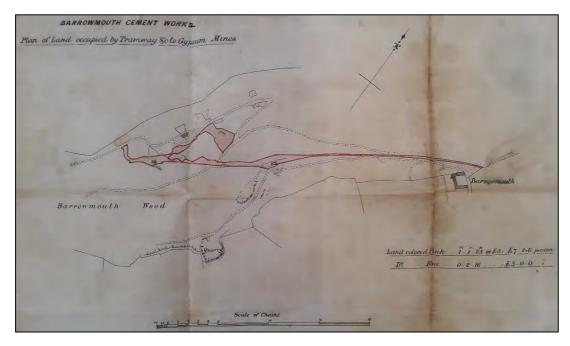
Plan of land occupied by tramway to gypsum works, 1888-1894 (Assets 1 and 36)
